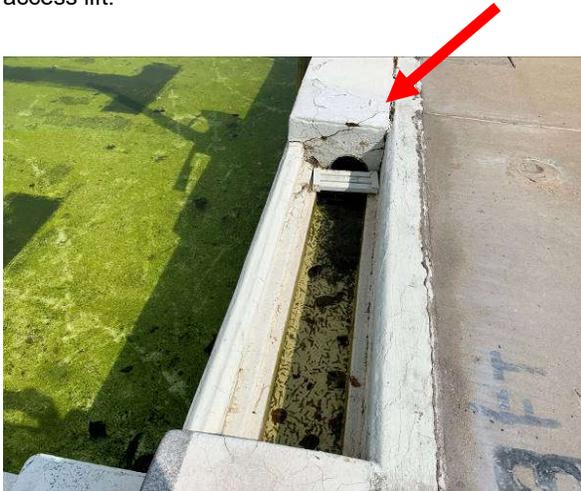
View of cracked concrete at gutter and deck to wall joint.
